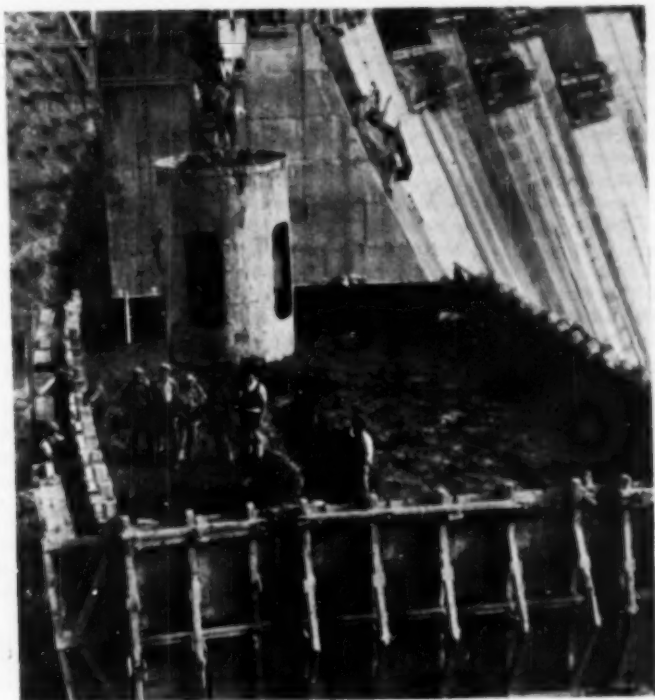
Placing Concrete from a 4-cu. yd. Bucket.
